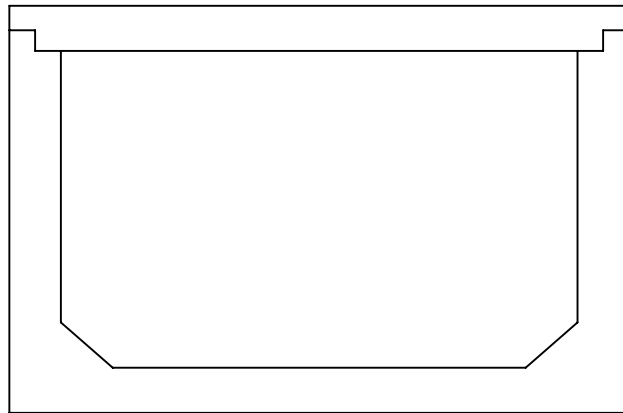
Three-sided U-shaped Culvert with a Flat Top Slab
